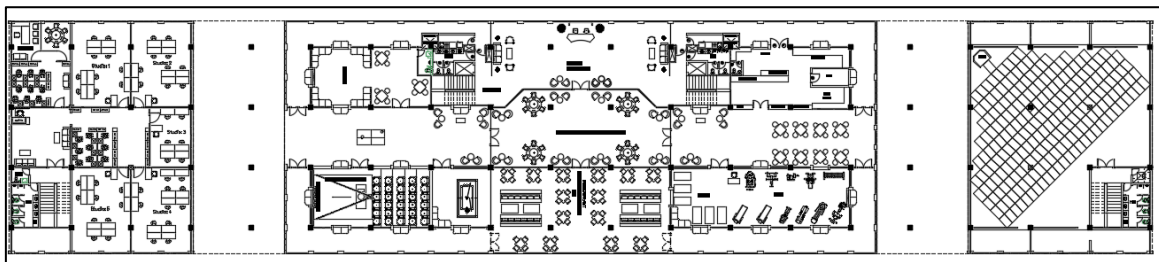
Level 1 – Amusement Floor, AV Room, Fine-Dining Restaurant, Café LHS – Skill Development Centre with Office & RHS – showing the mosque floor
